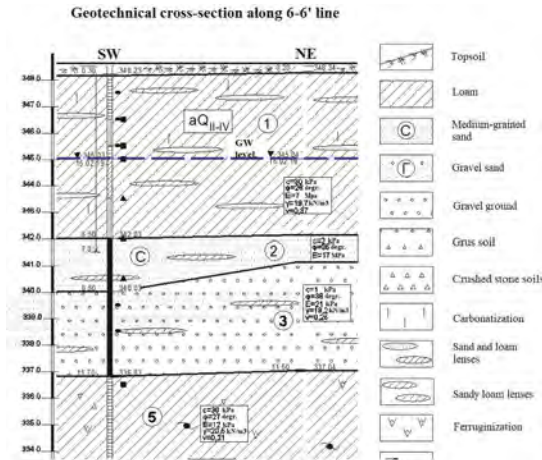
Geotechnical cross-section of the ground of the embedded structure on Mangilik El Avenue in Astana.
